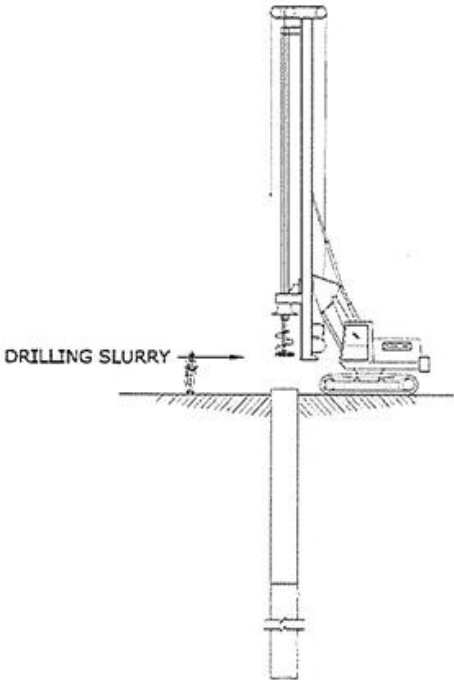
Excavation of Pile under Drilling Slurry to Founding Level
